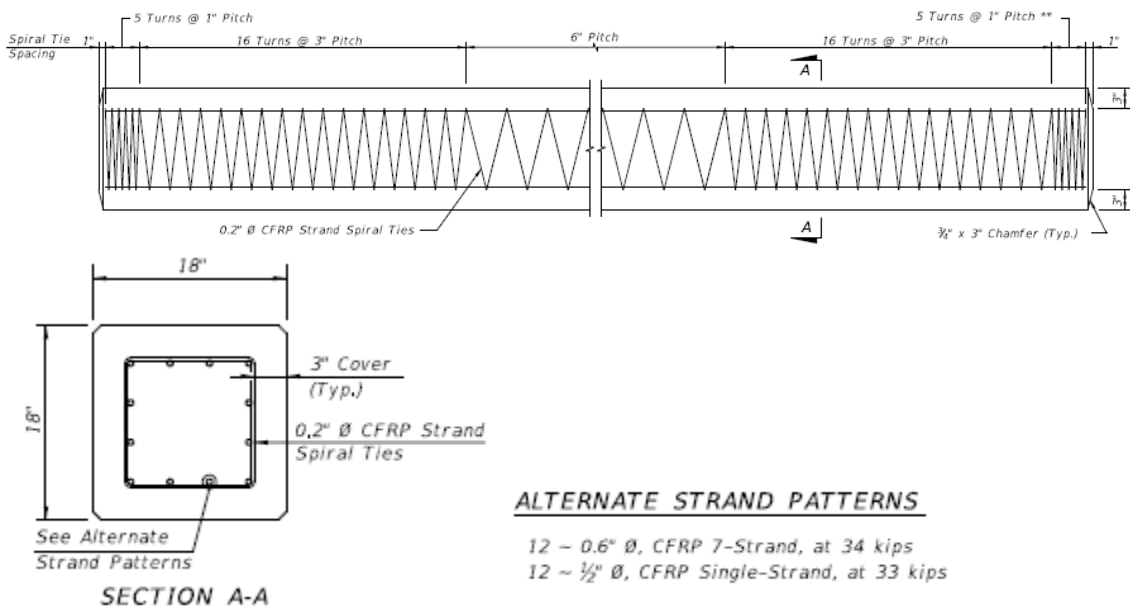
Details of prestressed concrete pile using CFRP strands and ties (FDOT Standard Drawings Index Series 455, 2018)
